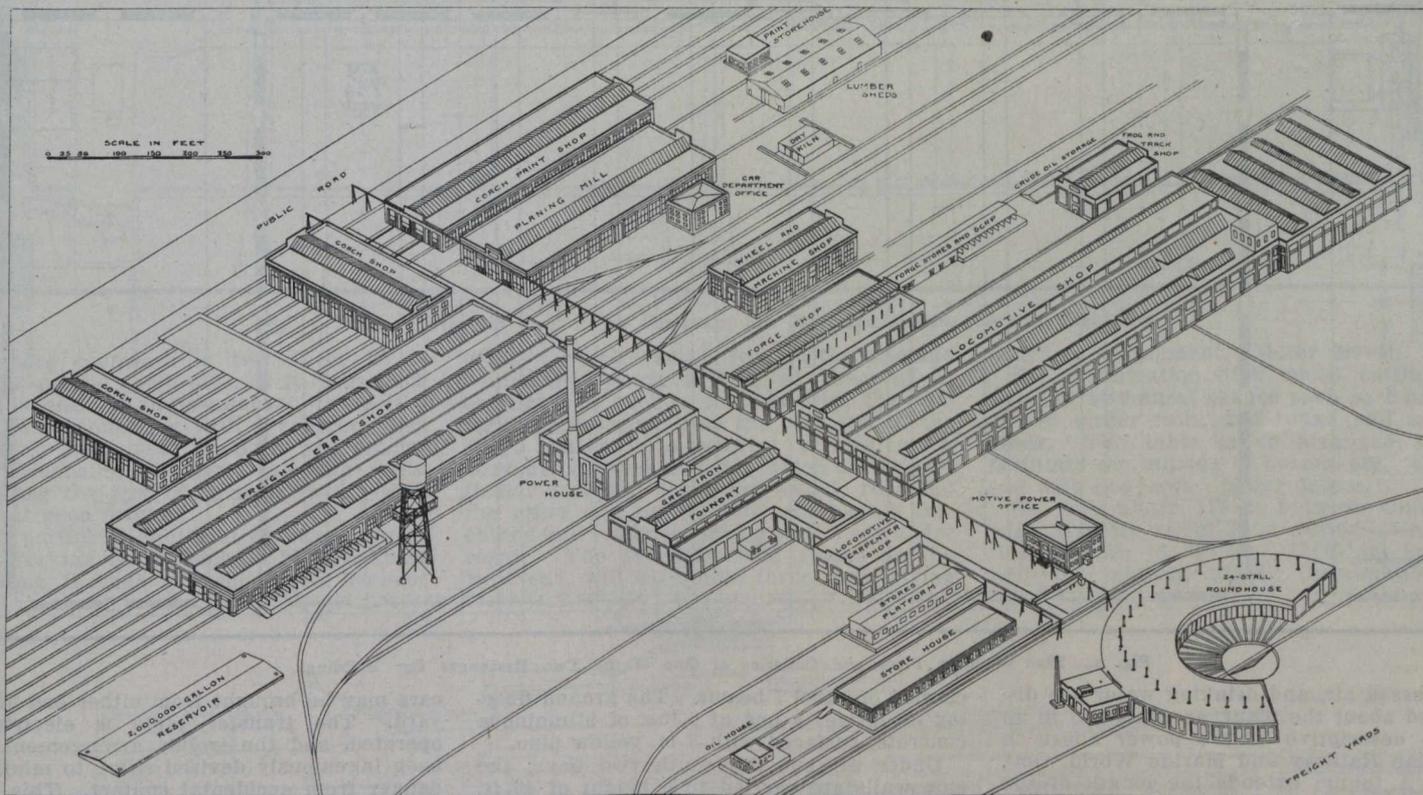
Isometric Projection of Locomotive and Car Department Buildings, National Transcontinental Railway
